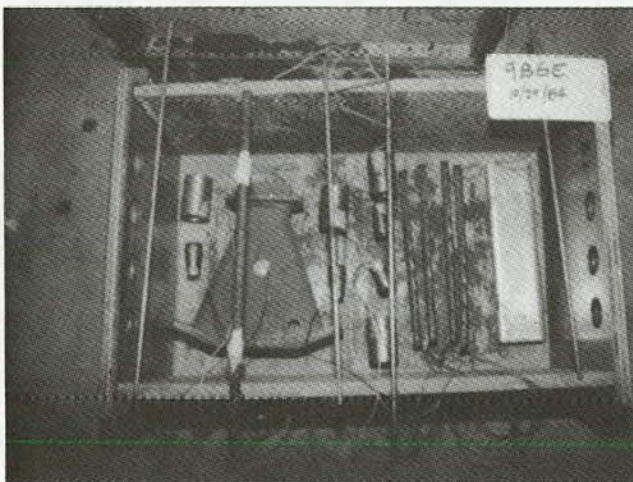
Element arrangement in small disassembled anchorage specimen prior to casting concrete.
